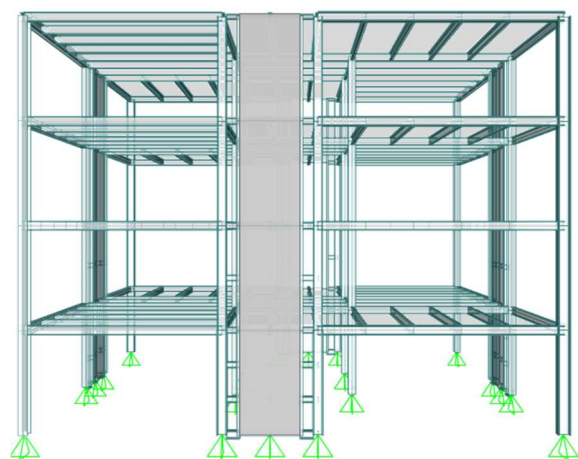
Structural model of the 3D multi-story building with perimeter hybrid coupled walls (HCWs) and replaceable shear links (Sap2000 [19] model - view with extruded elements)
